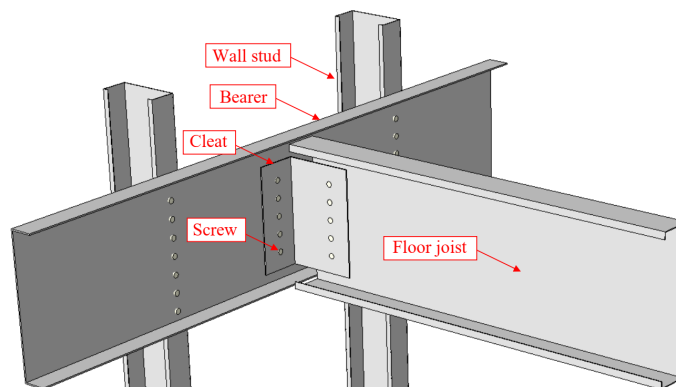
Typical floor-to-wall connections using steel bearers and cleats.
